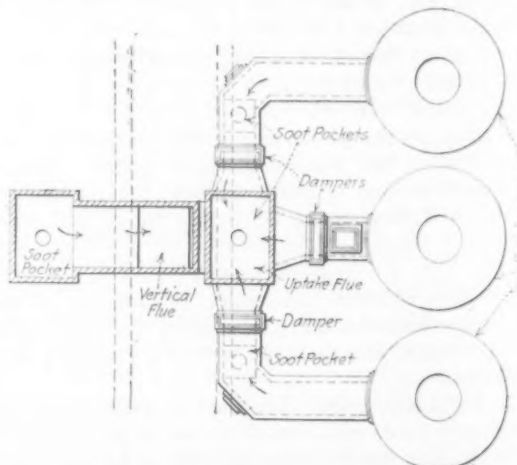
Horizontal Section Above Producers and Plan of Layout of Producers and Gas Collecting Passages. This shows locations of dampers and of soot pockets
